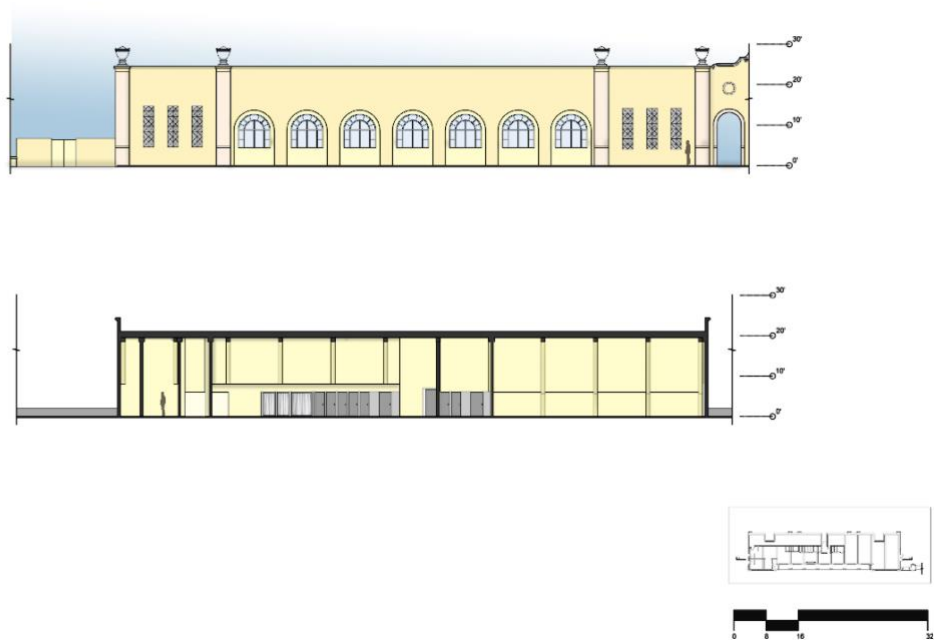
Existing Elevation + Longitudinal Section – Diamond Head Side
